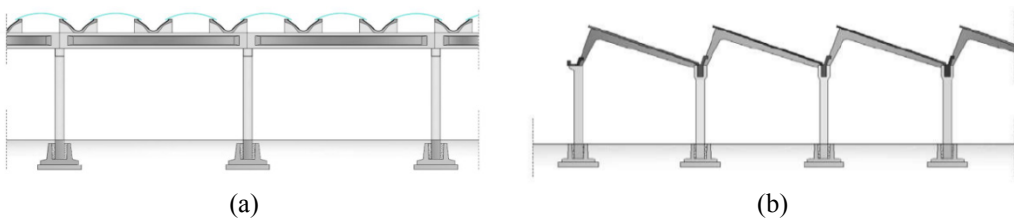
(a) Discontinuous plane roof and (b) shed roof (Bonfanti et al., 2008).
